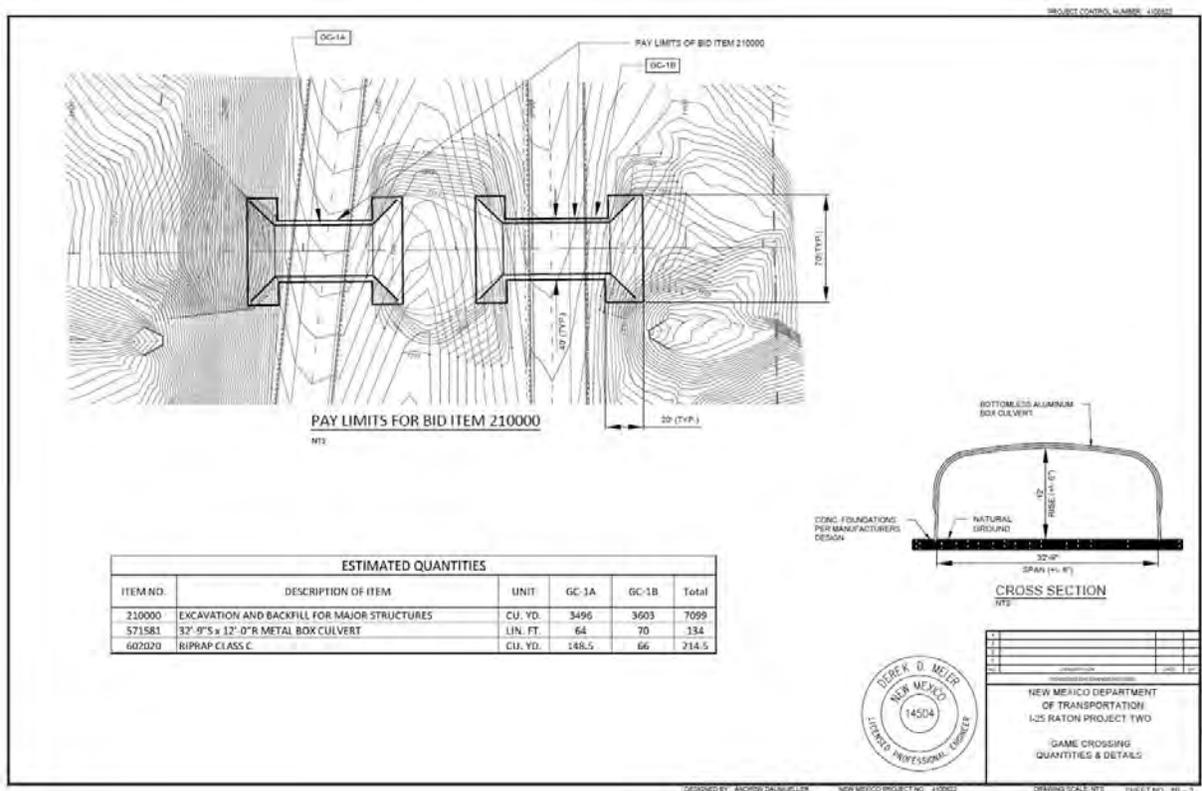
I-25 Raton Pass plans for wildlife crossing metal arch culverts.
